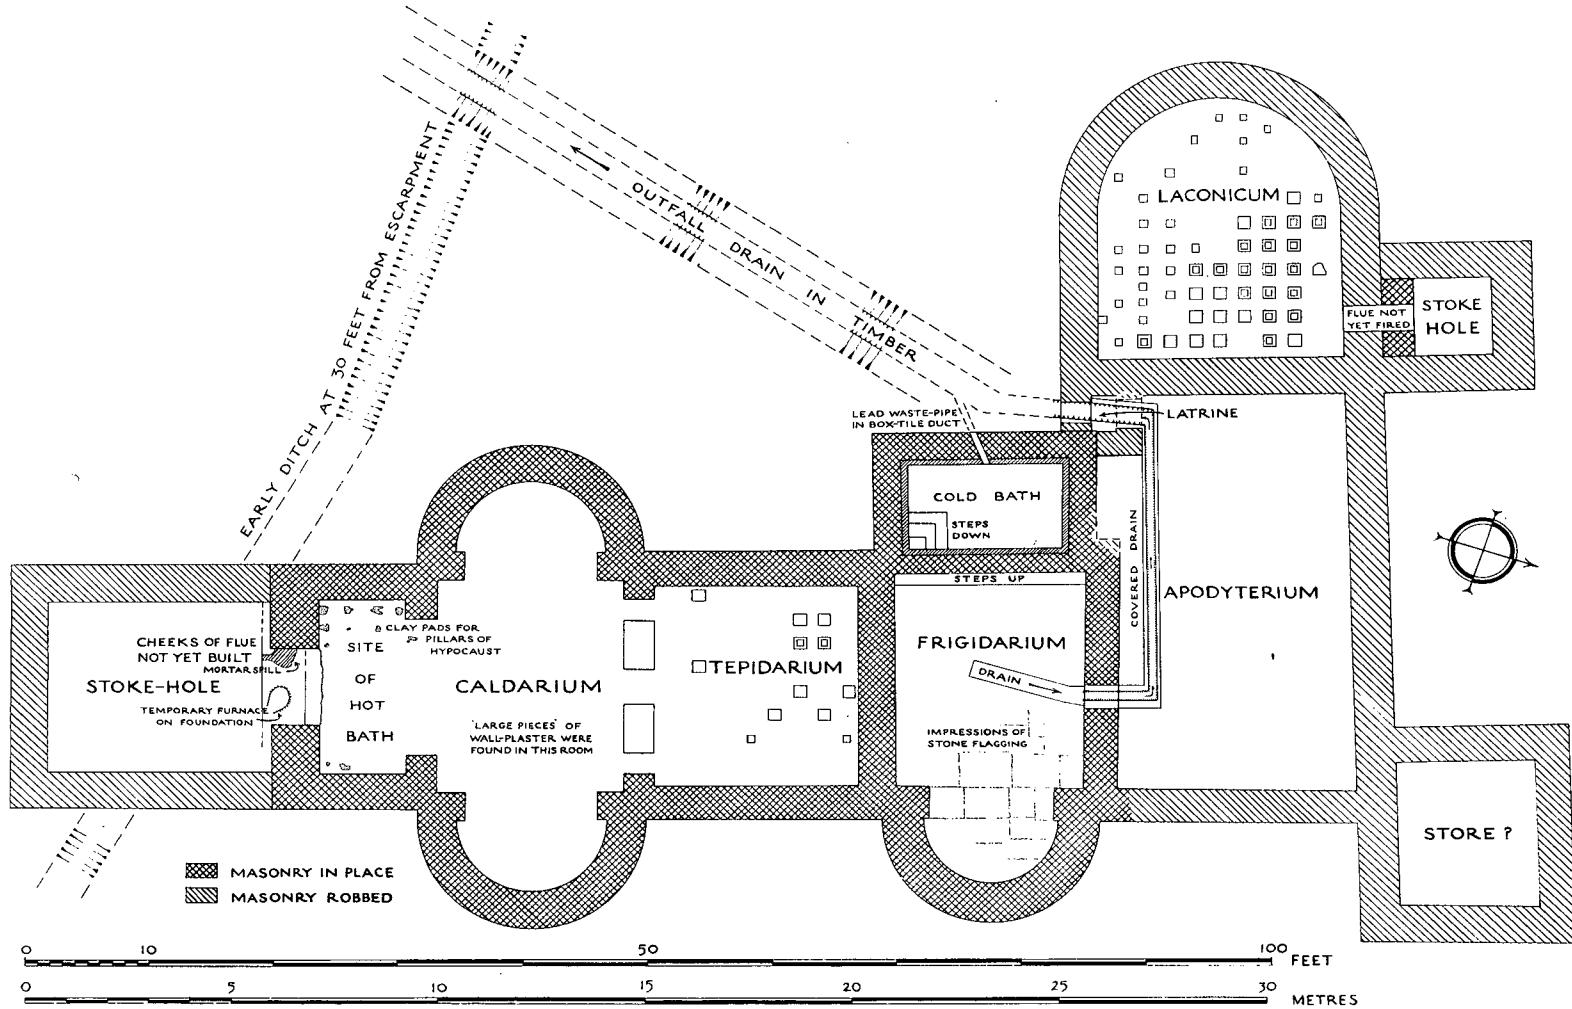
The Officers' temporary Compound, plan of Bath-building. Scale, 1:190.
